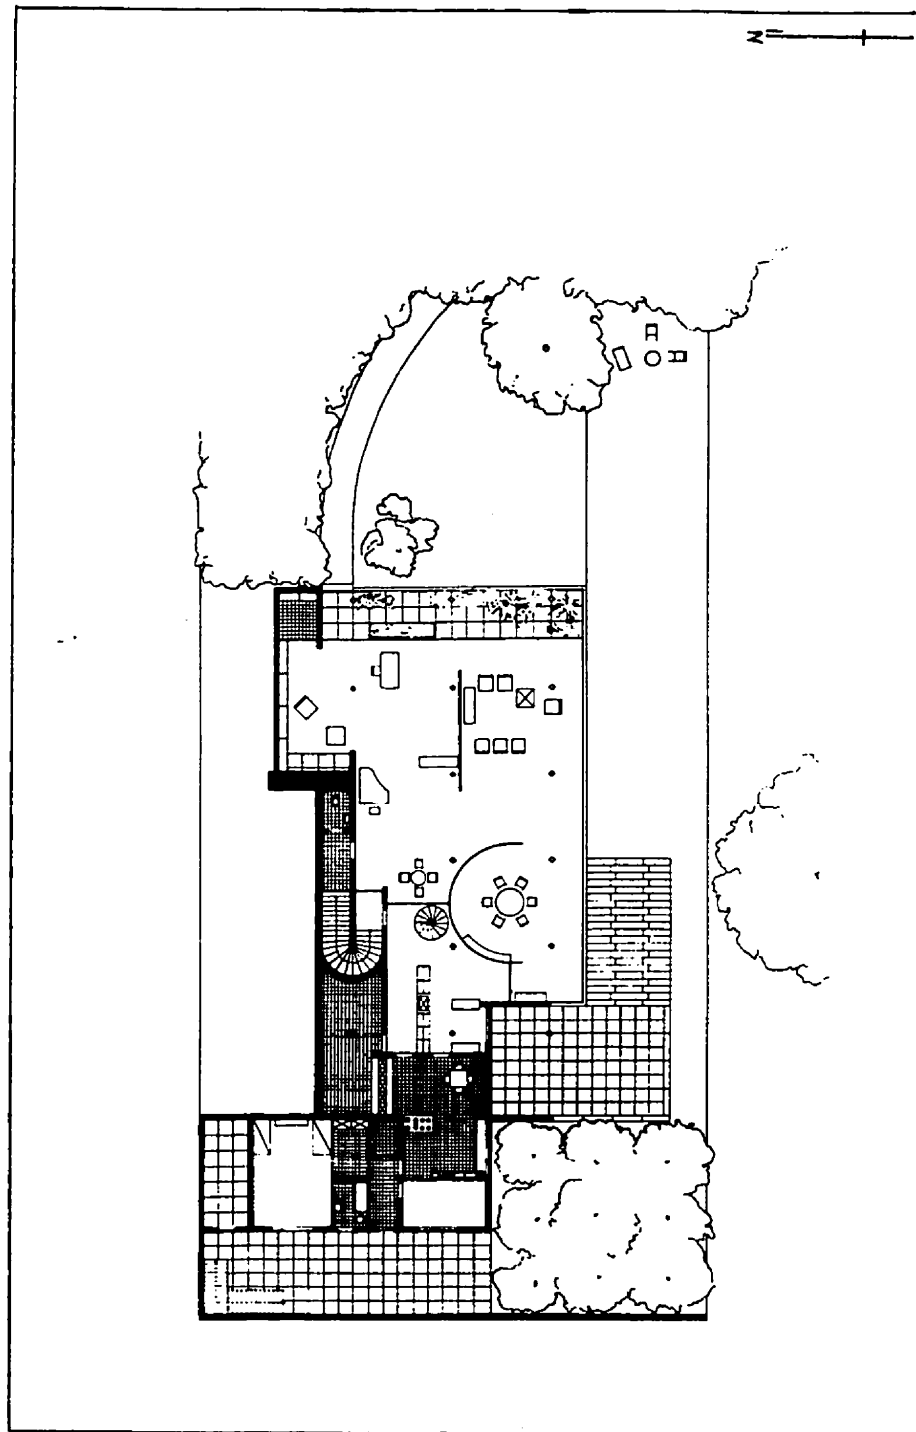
Plan of lower floor, Tugendhat House, 1929-31.
